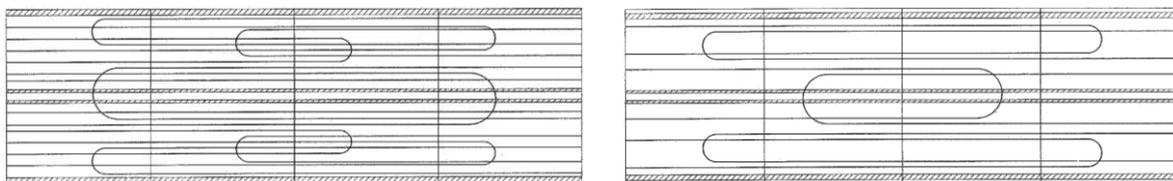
, PRESTRESSING DIAGRAM IN THE WIJKER TUNNEL
